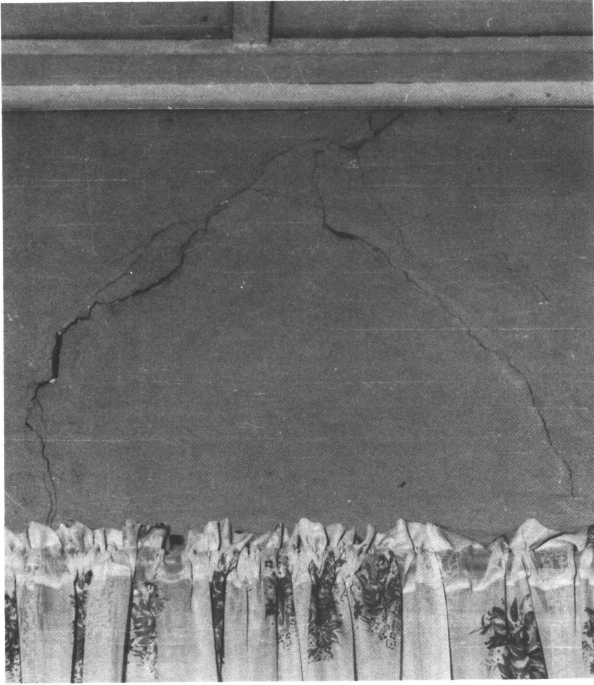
Cracking in a wall of a house in Lithgow.
